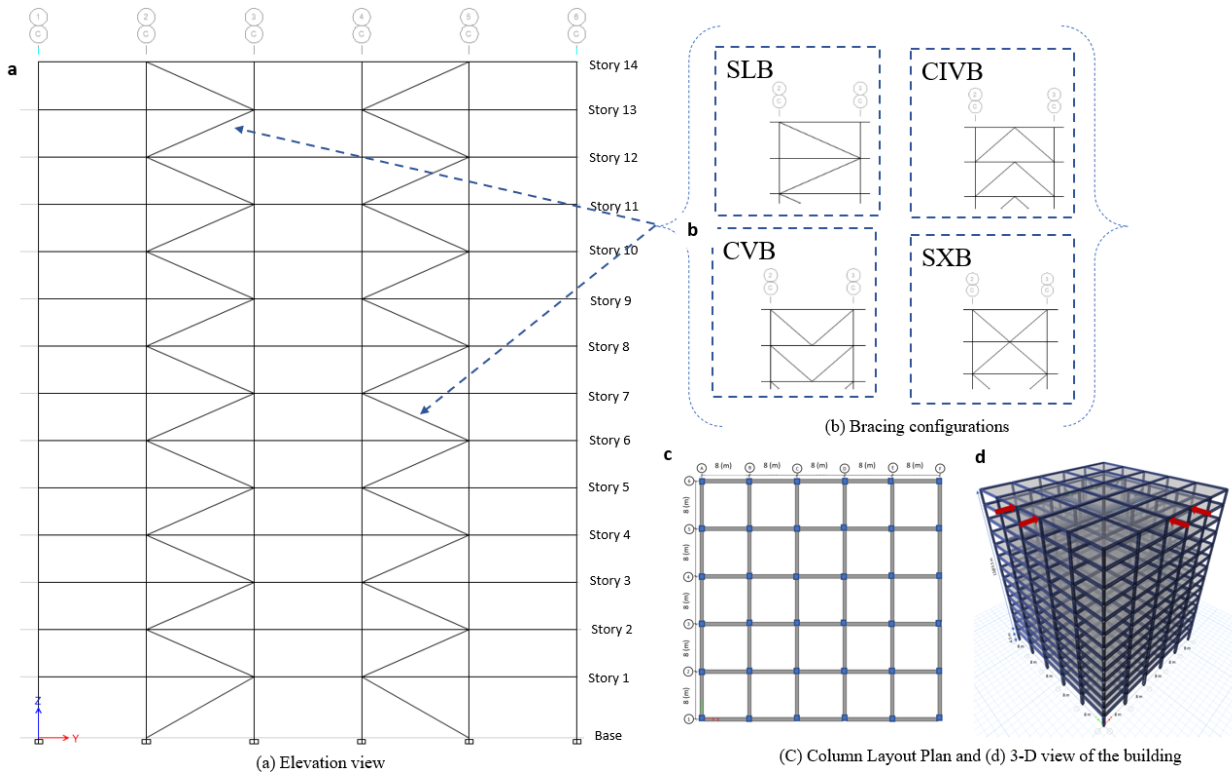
Structural models with Single Leg Braces (SLB), Chevron Inverted V Braces (CIVB), Chevron V Braces (CVB) and Split X braces (SXB) and column Layout Plan
